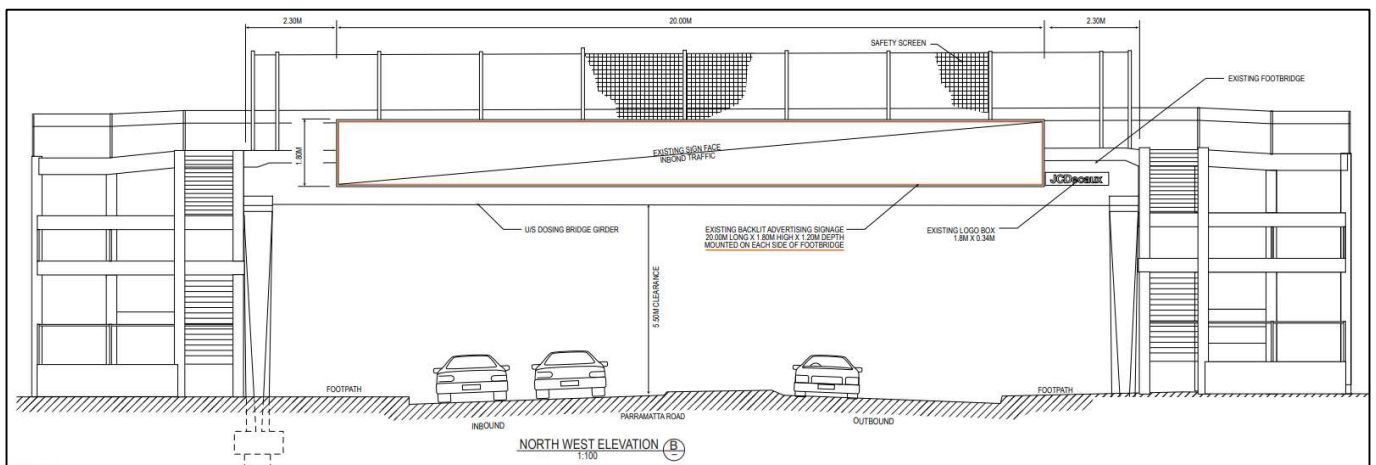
| Sign elevation – west (source: revised architectural drawings 27/5/24)
